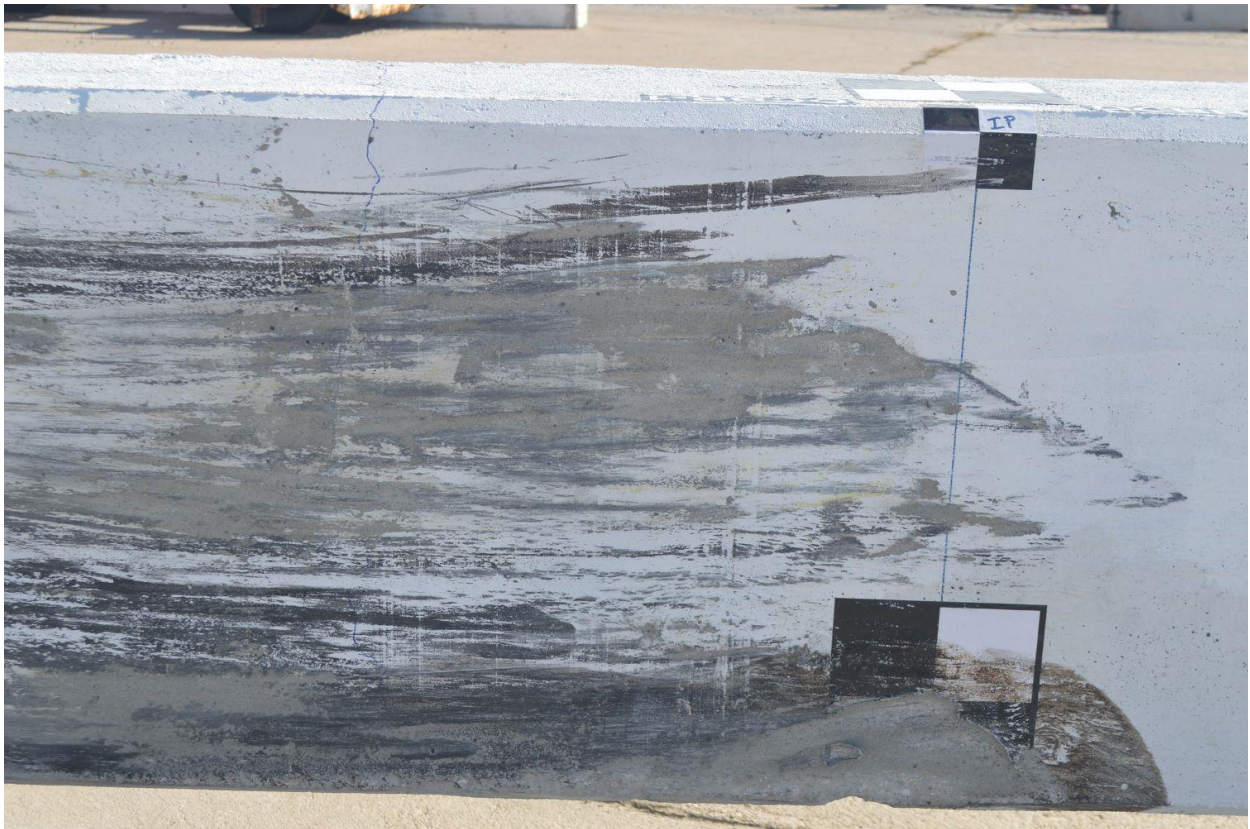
Concrete Beam Damage, Impact, Test No. OCBR-1
